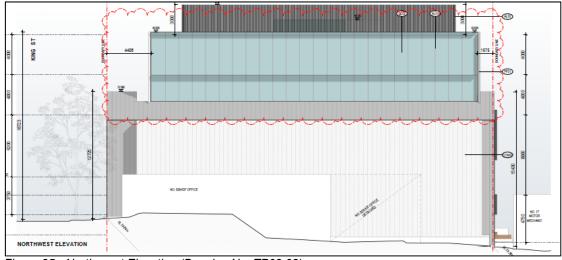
North-west Elevation (Drawing No. TP02.03)
